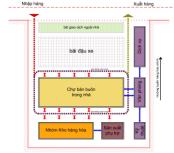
APF WSM's master plan. - Model T1 (1-direction approach)
